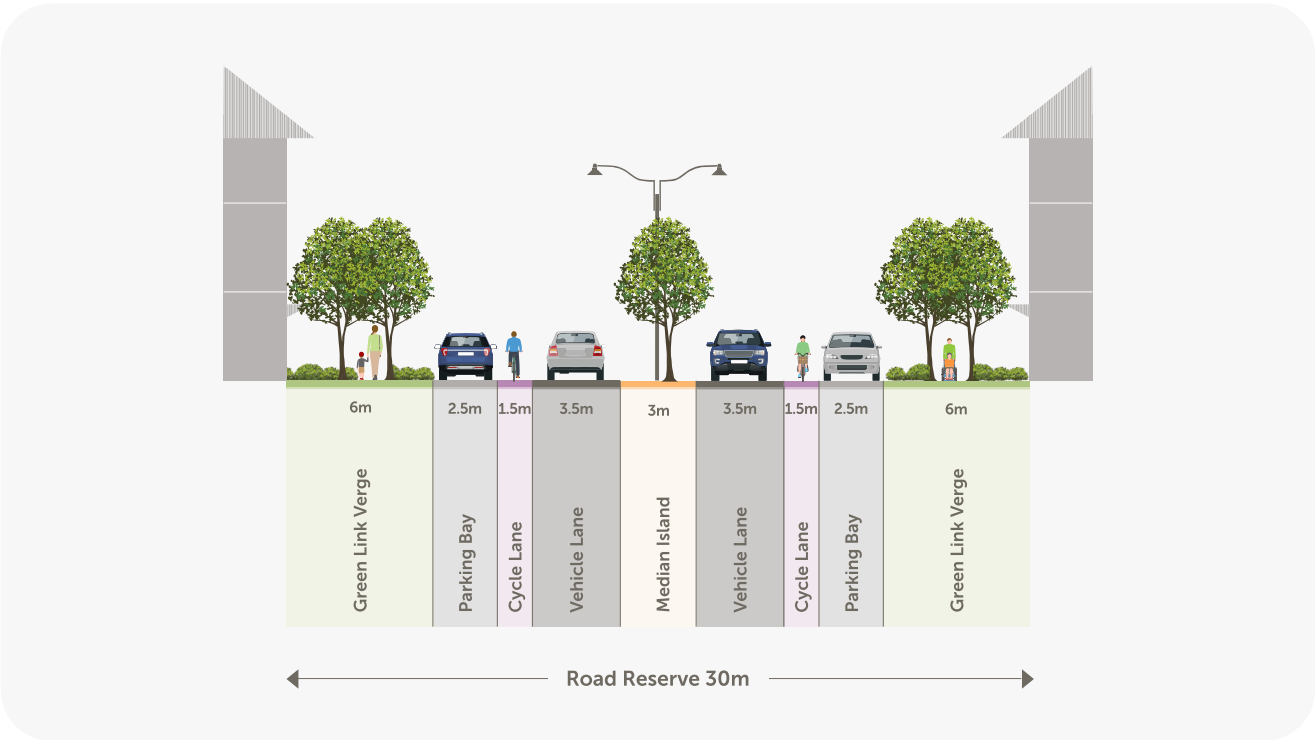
Pollard Street / Wilson Street / Hampton Road Lovegrove Street and Alderson Street Cross Section
